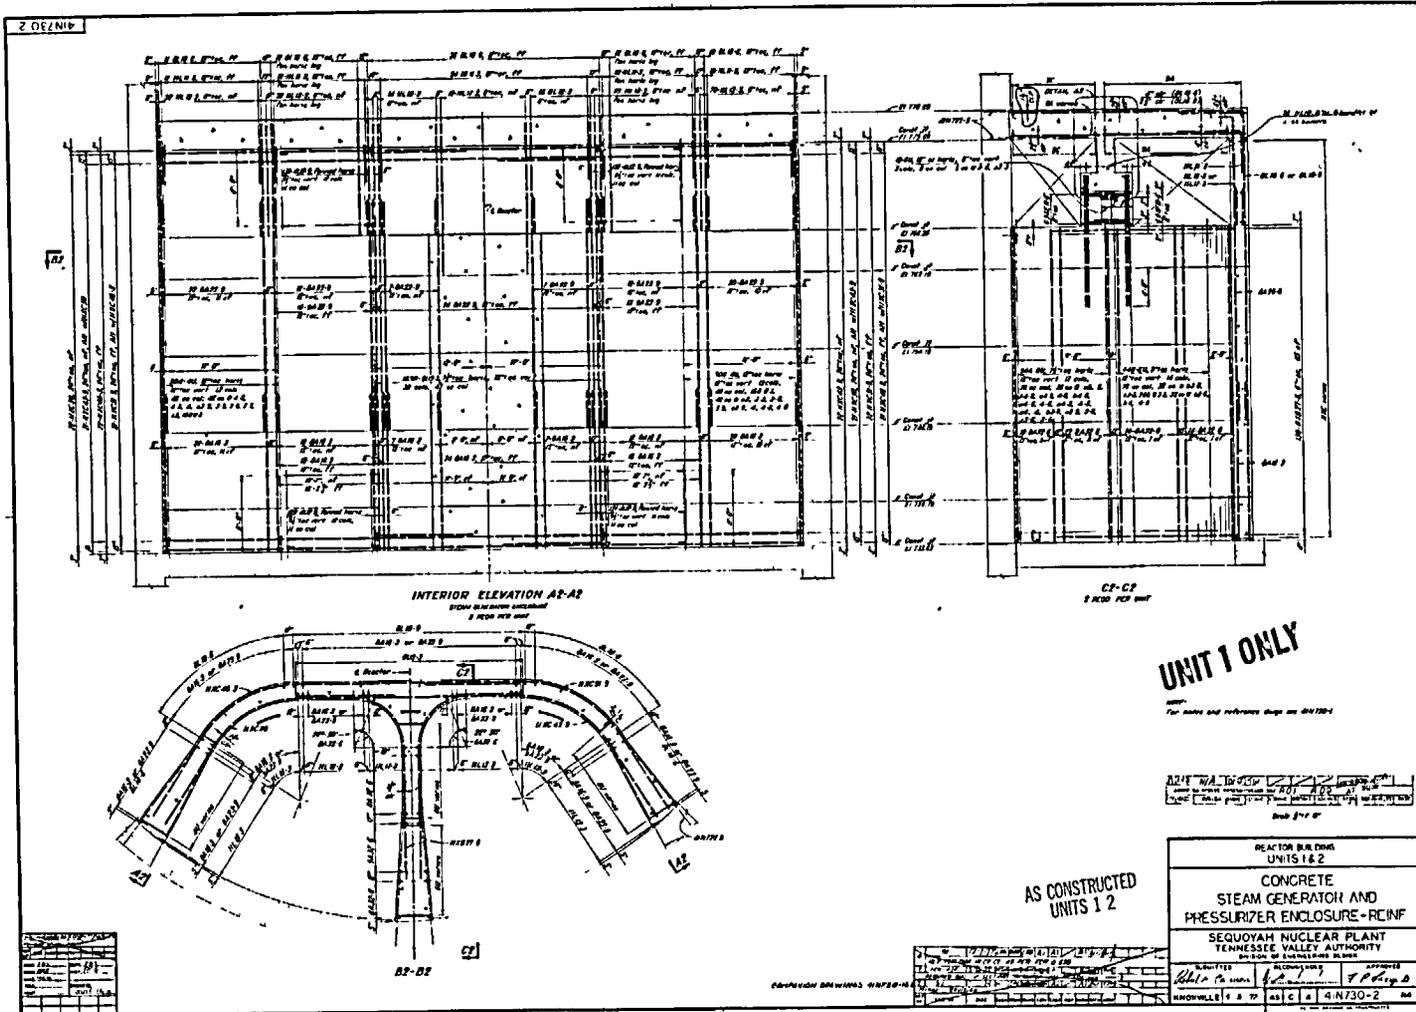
Concrete Steam Generator and Pressurizer Compartment - Reinforcement
